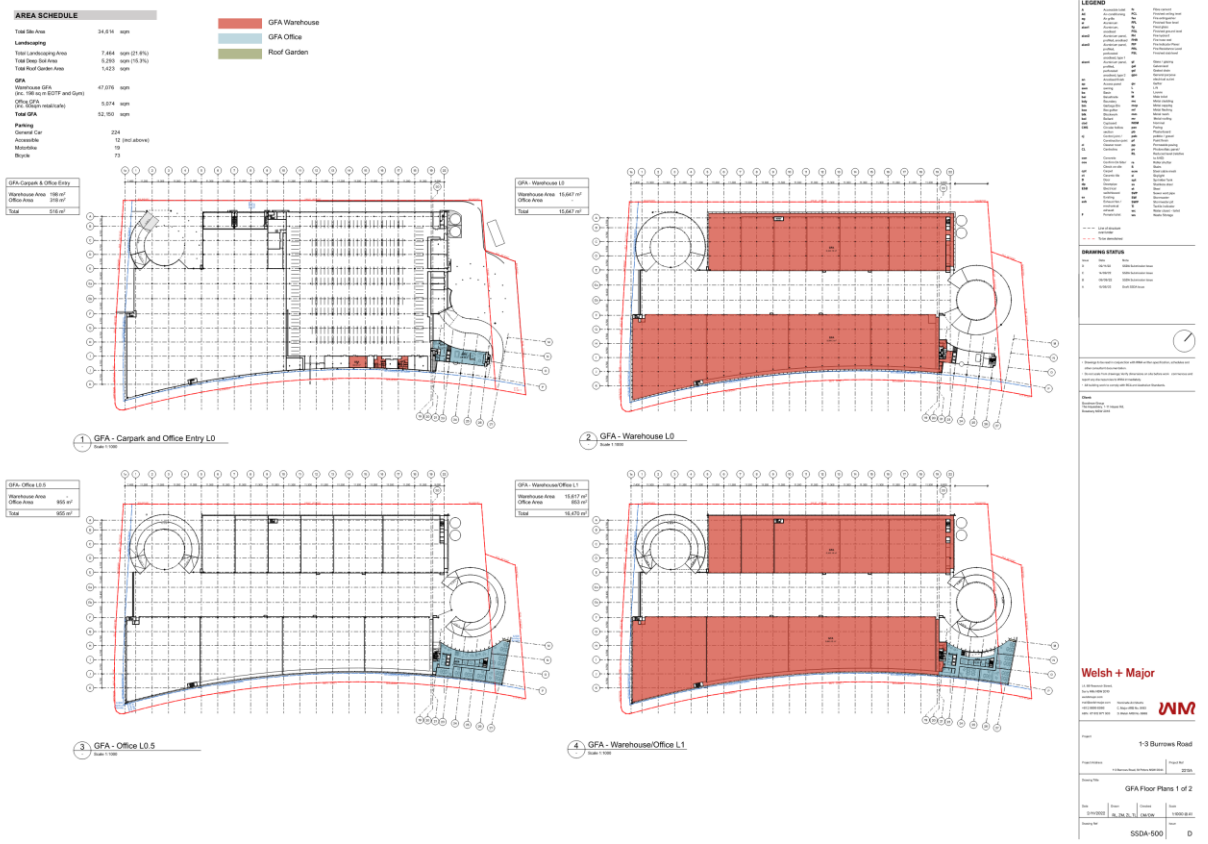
Proposed Development – GFA Floor Plans Sheet 1
